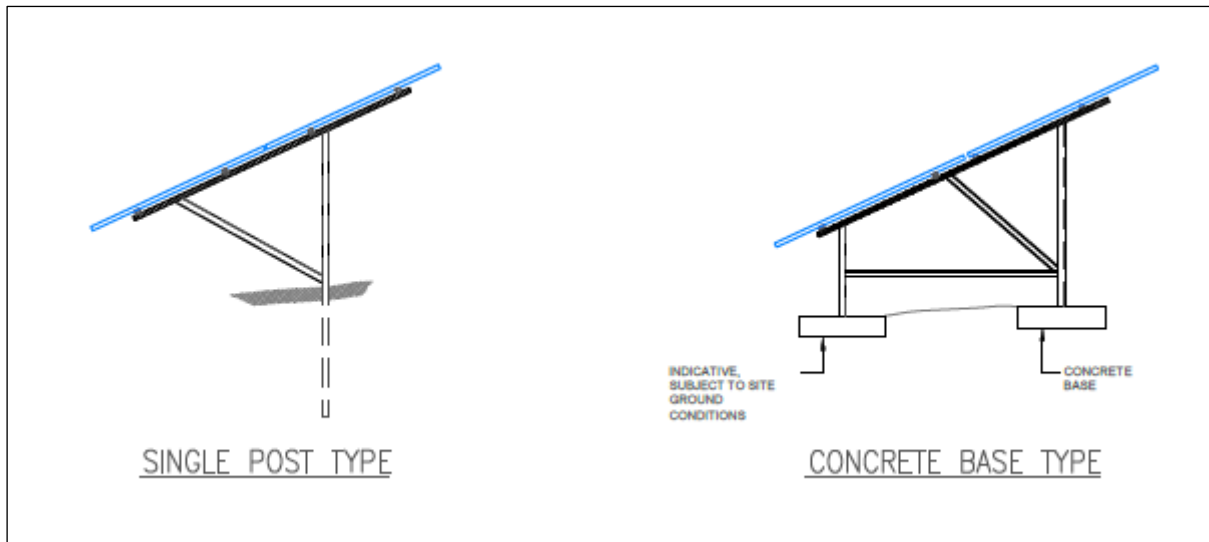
Typical Cross Section – Single Post Ground Mounting System and Shallow Concrete Base Mounting System
